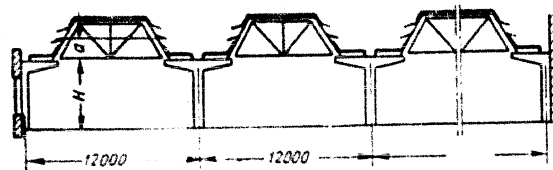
Scheme of Multiaisle Building with T-Form Reinforced-Concrete Columns and Interior Water Drainage
